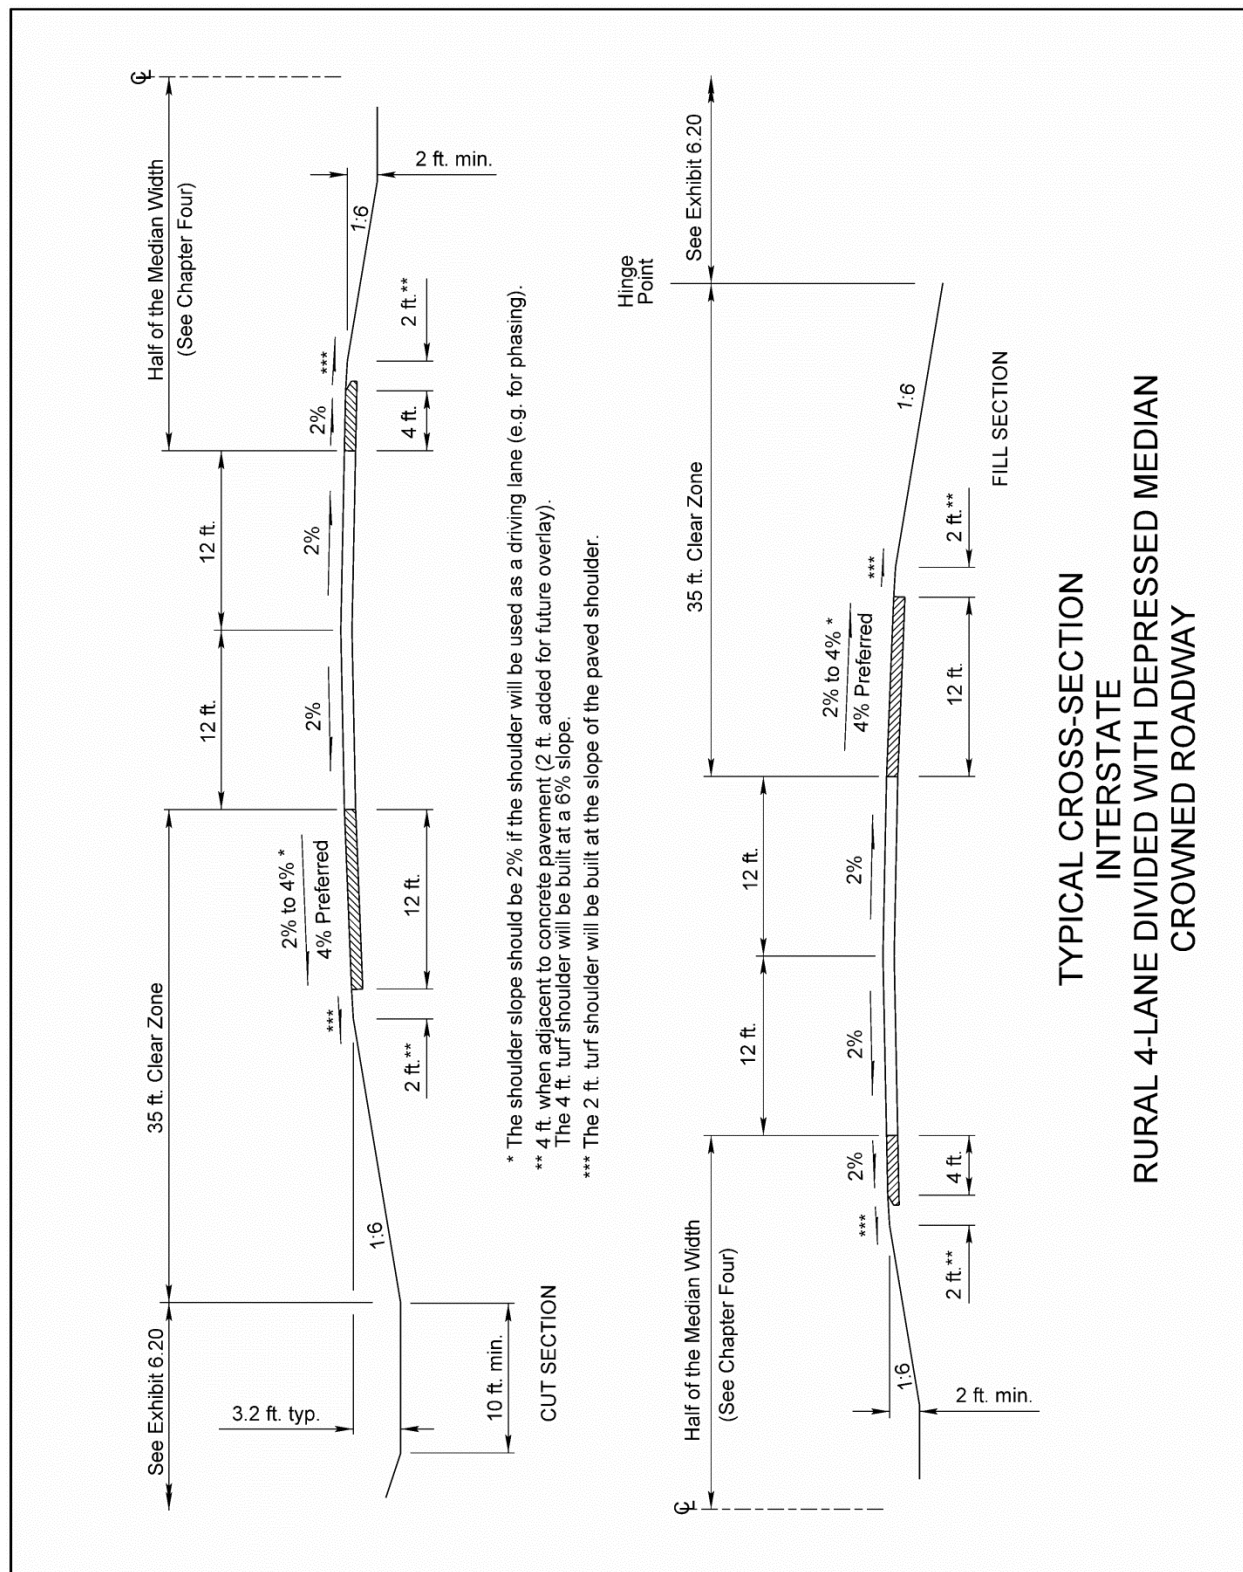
Typical Section - Rural Four-Lane Divided Interstate with Depressed Median (Crowned Roadway)
